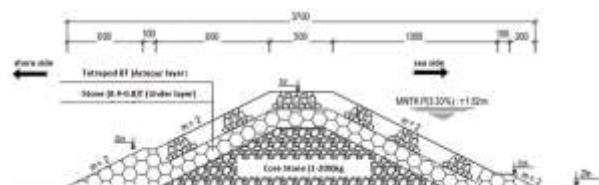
Typical cross-section of the sloped roof breakwater with Tetrapod protection layer
